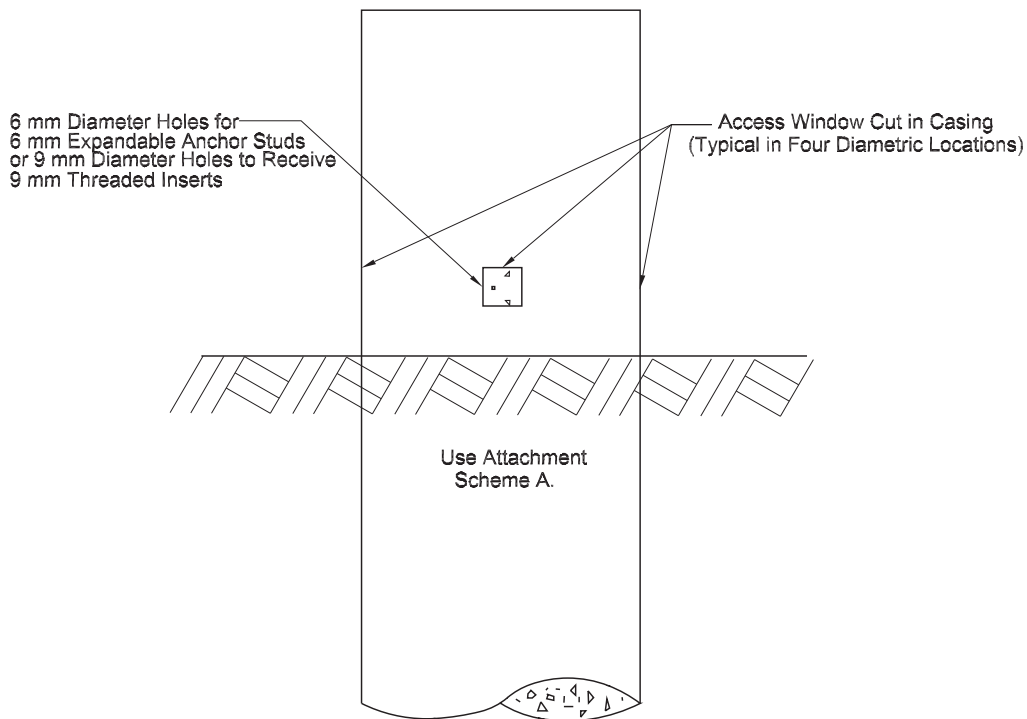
Typical Arrangement for Attaching Transducers to a Non-Driven Pile
